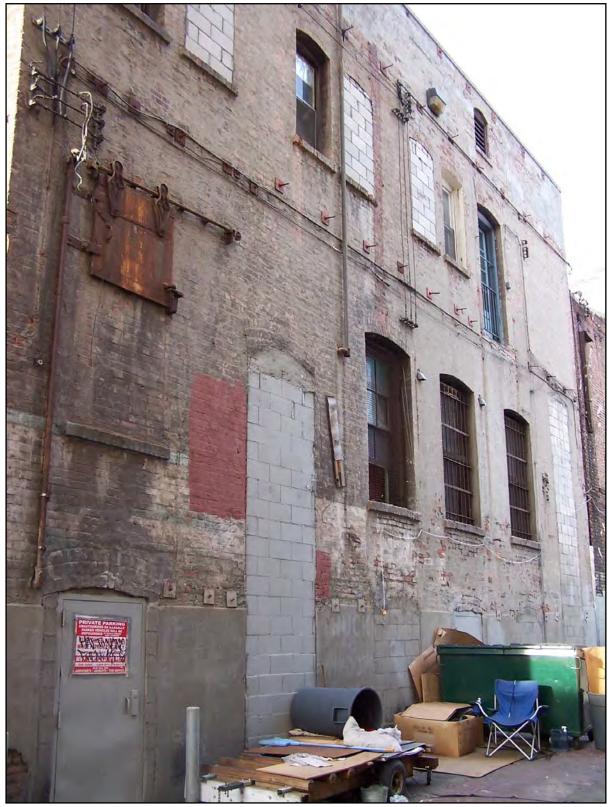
Back of existing Genesis Hotel building – View from Werdin Place Source: ICF Jones & Stokes, December 2009
